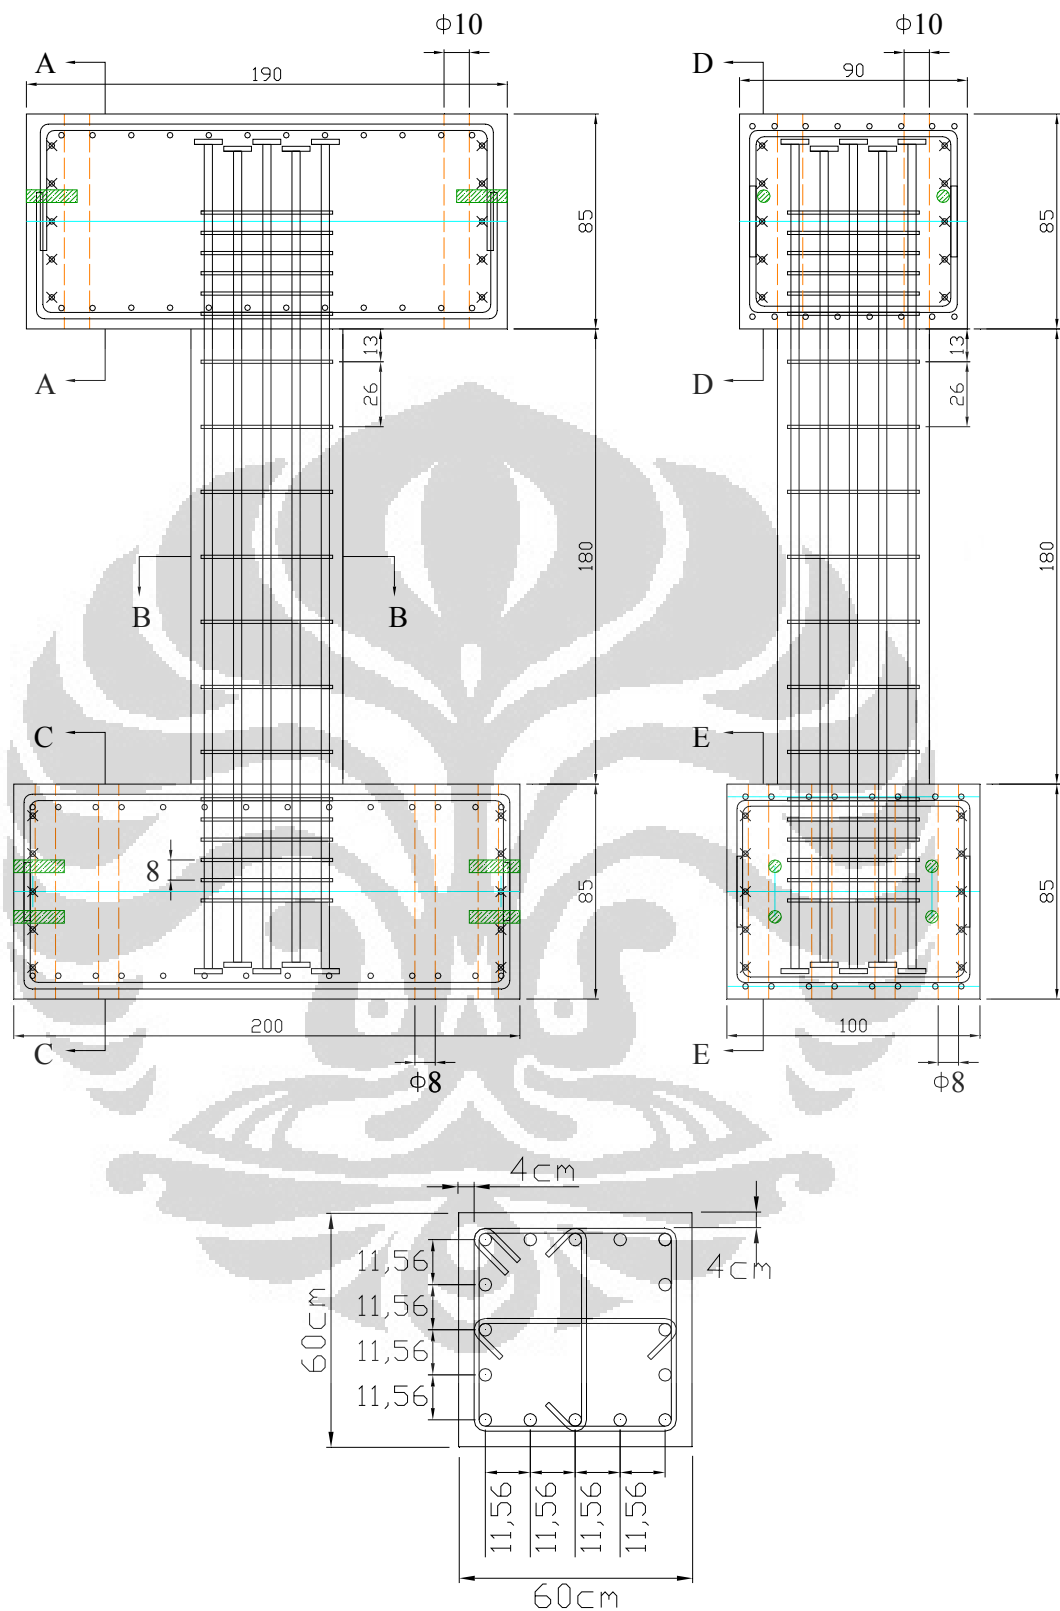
HSC Columns Design in cm with 260 mm transverse reinforcement spacing
